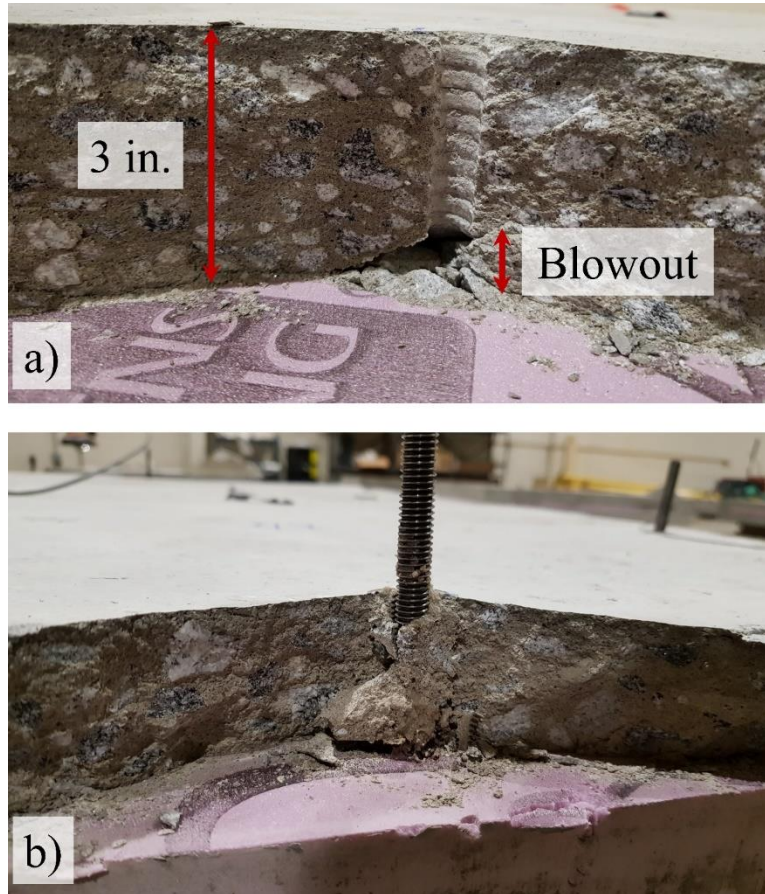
Back-face blowout in a) screw anchors b) adhesive anchors.
